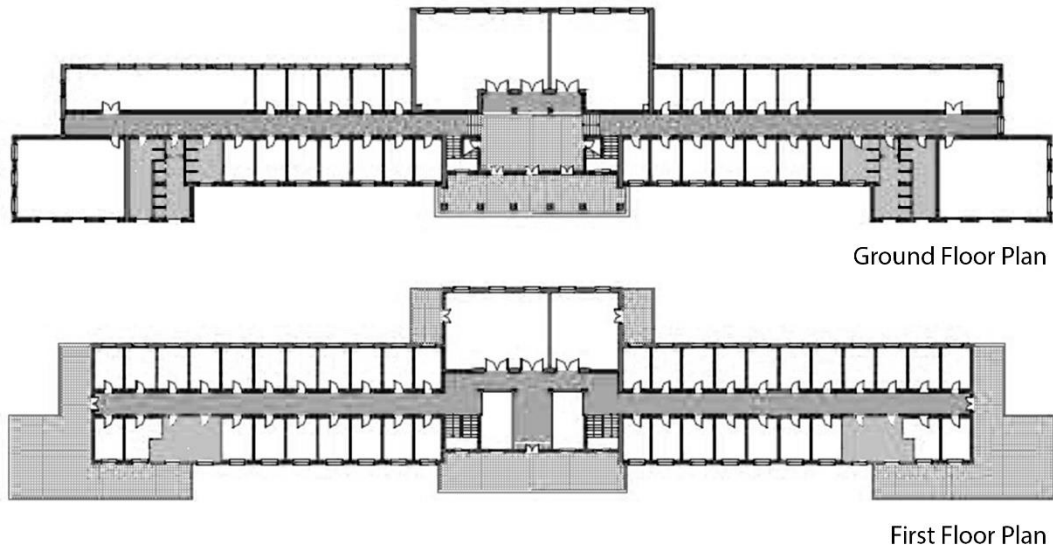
19. Single Apartment Plan Layout (Recoloring by Merve Köz, original plans from Asiliskender, 2002, p. 89).
